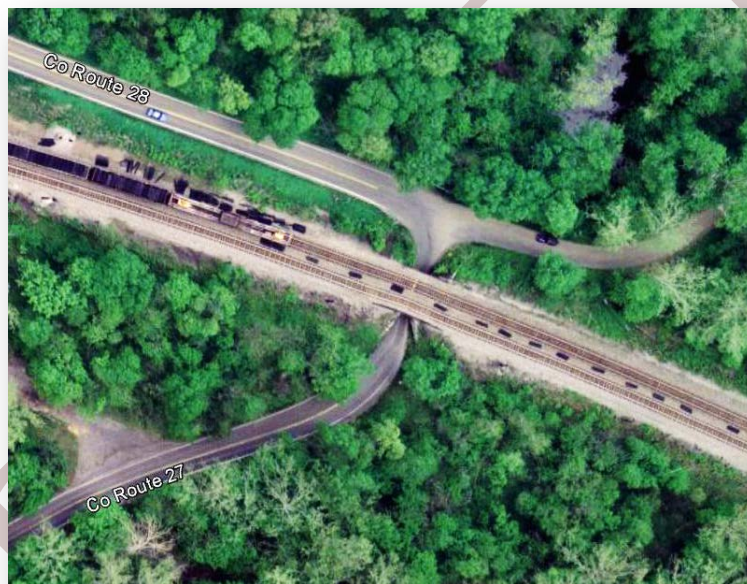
Bakerton Road Railroad Underpass, Source: Google Earth
